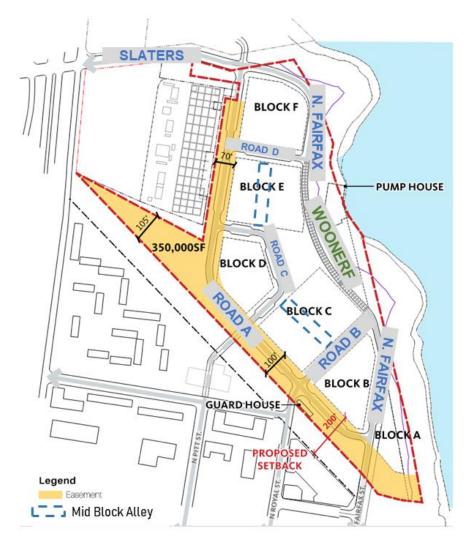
Proposed site layout and street network, including area of easement (in yellow).
